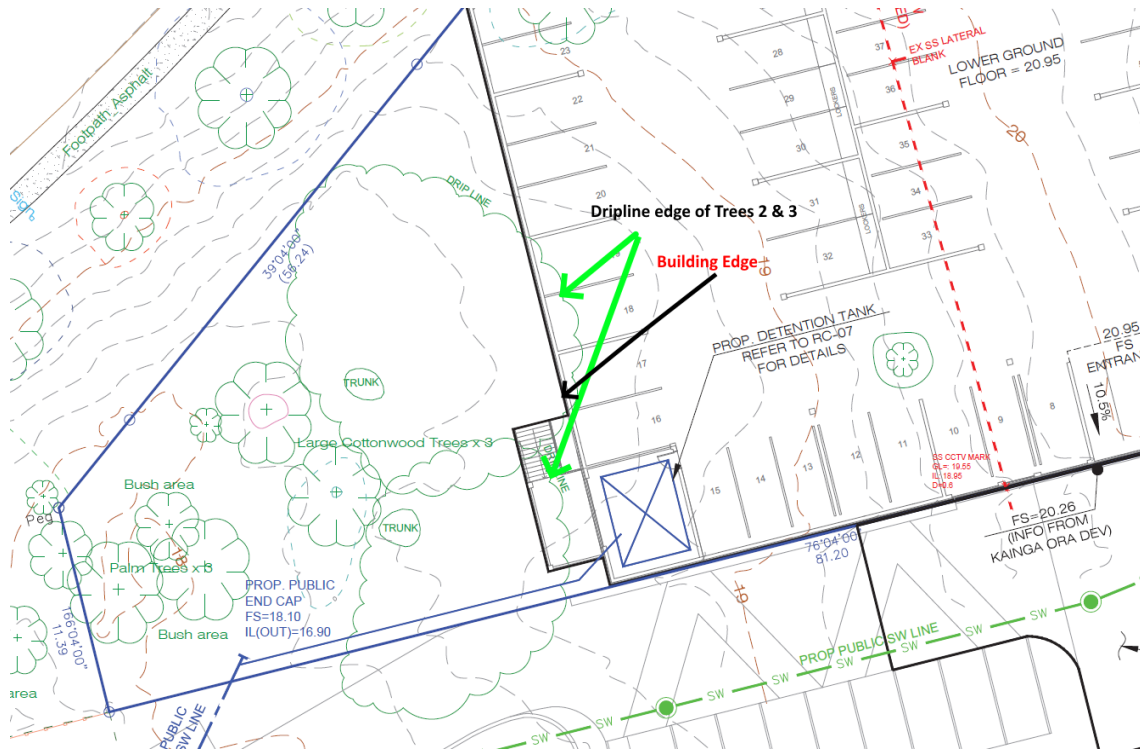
Plan showing protected root zone extent of Trees 2 & 3 (larger image in Appendix B of report)
